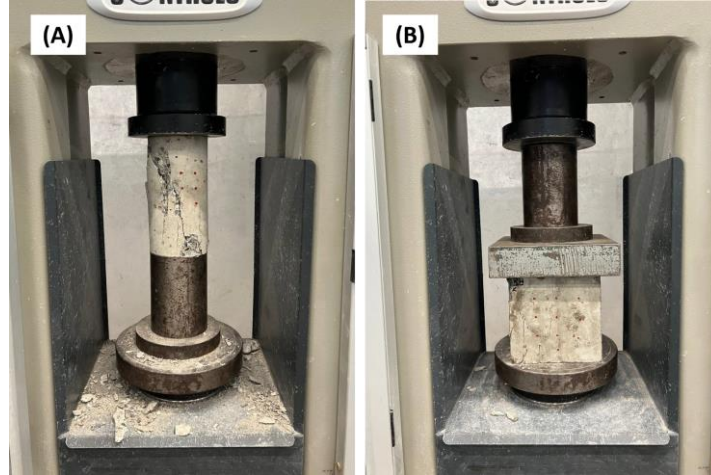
Compressive tests, (A) on cylindrical specimens and (B) on cubic specimens
